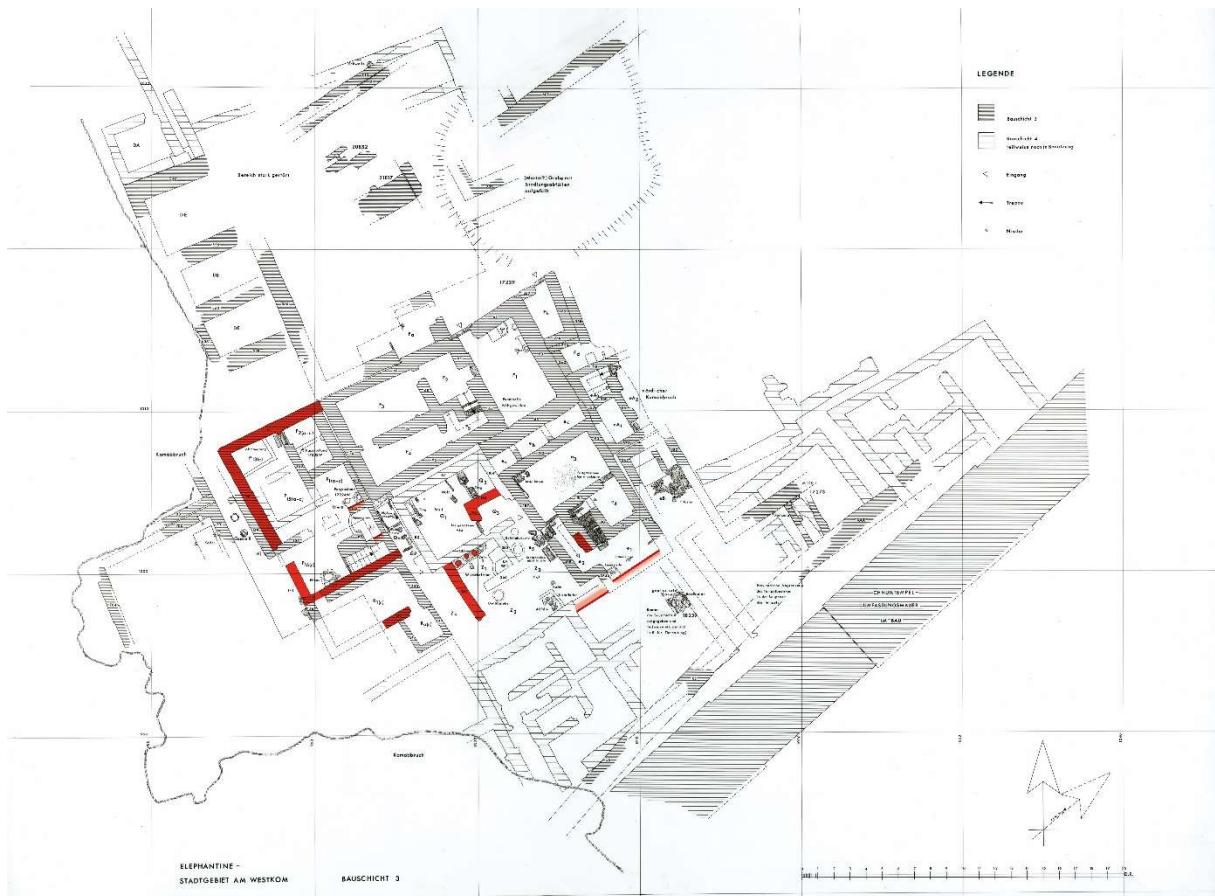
Western Town, consolidated mud-brick walls (red) in levels 4 and 3 (plan: A. Krekeler © DAI)
